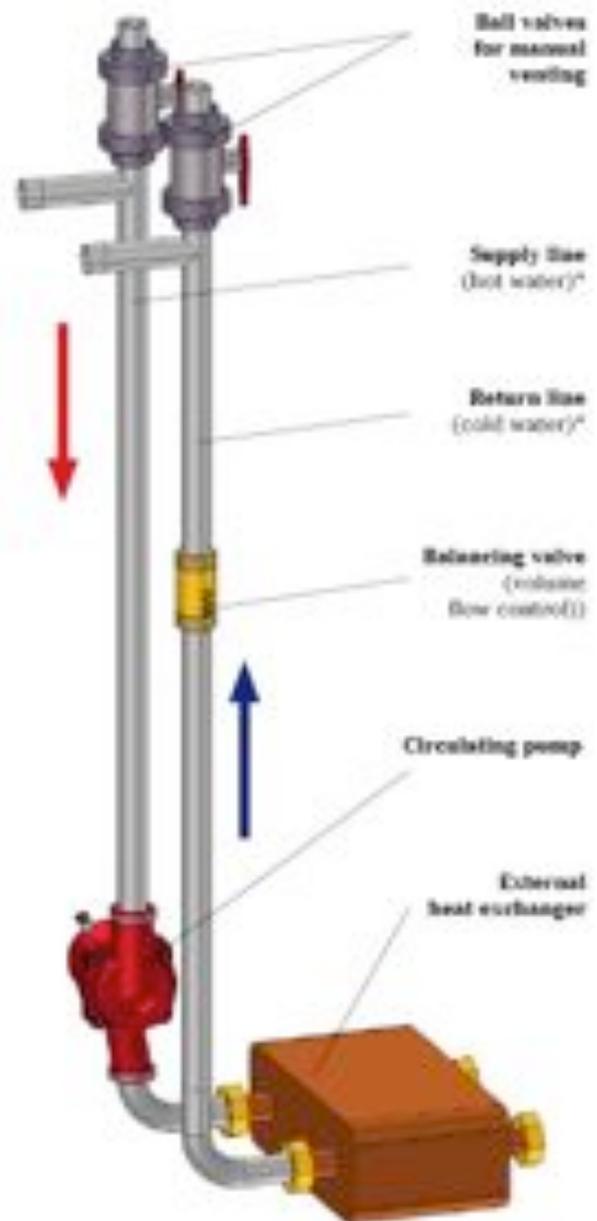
Connection assembly for layer addition system (unloading) (This connection assembly design represents a non-binding example and must always be verified by the customer.)
